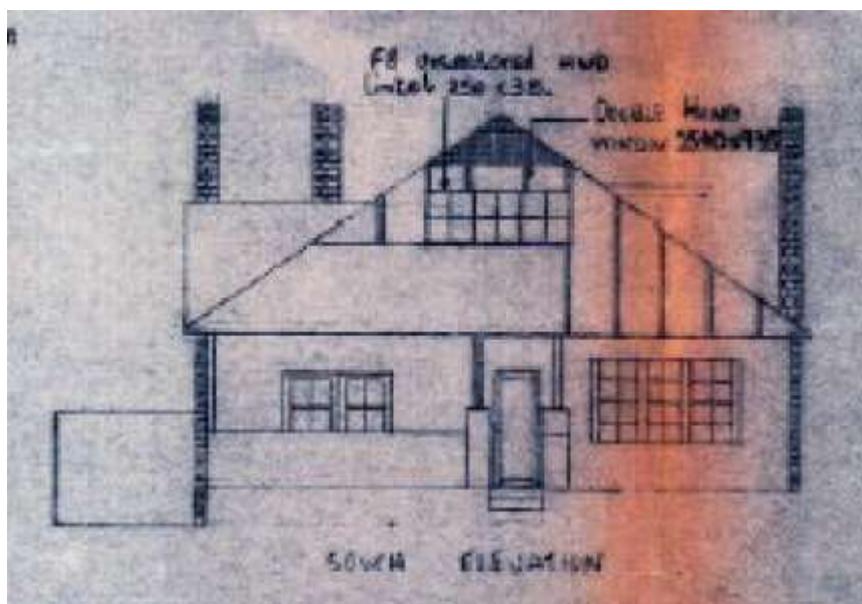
Detail from BP #79084/1985 showing the insertion of attic windows to the front façade, and possibly creation of French doors (left-hand side, beneath the verandah). Otherwise this façade is original including: half-timbering to the gable, porch roof that covers about half of the façade with timber posts on masonry piers, a solid porch balustrade, and multipane windows.
